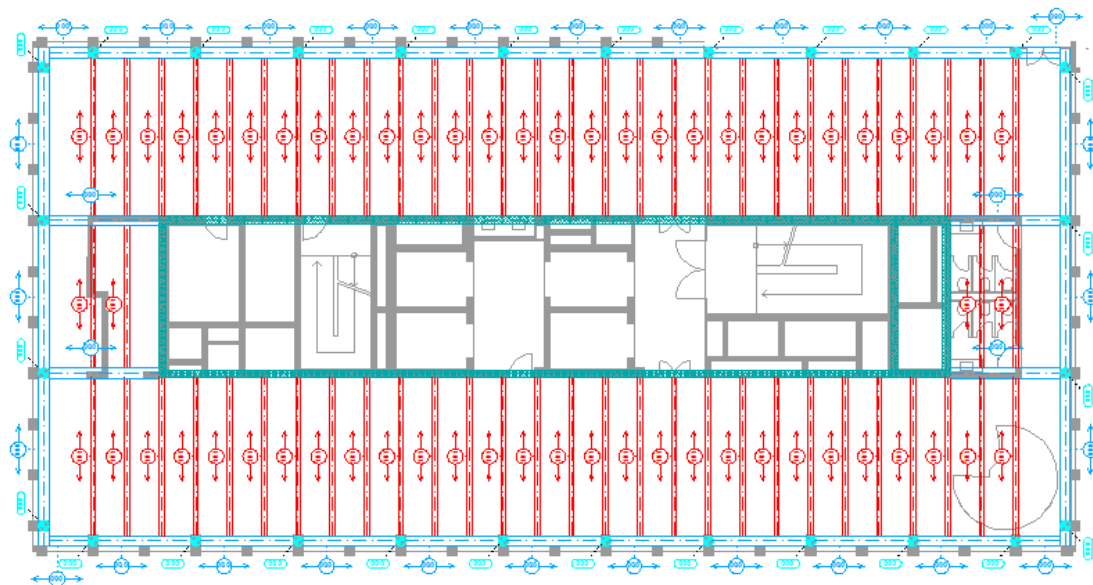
Floor plan of the Arbo building (Jung 2018).
